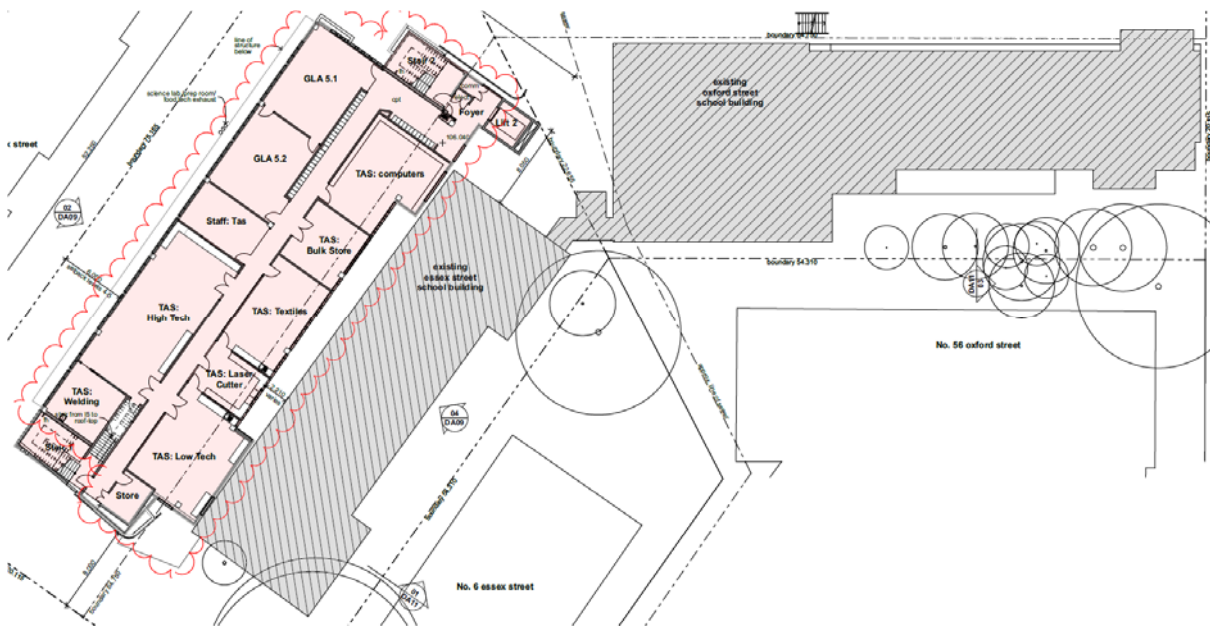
Proposed Level 5 plan under DA/89/2017/C.
